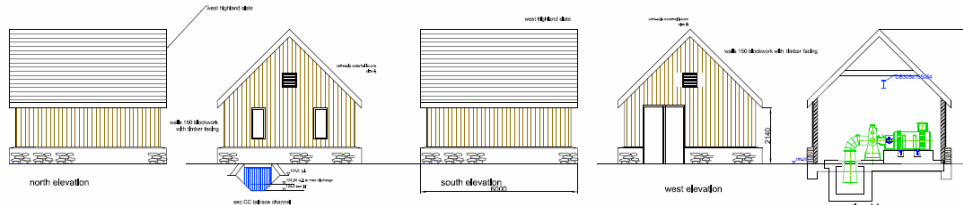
& 11 - Scheme 2 Powerhouse elevations and photomontage
